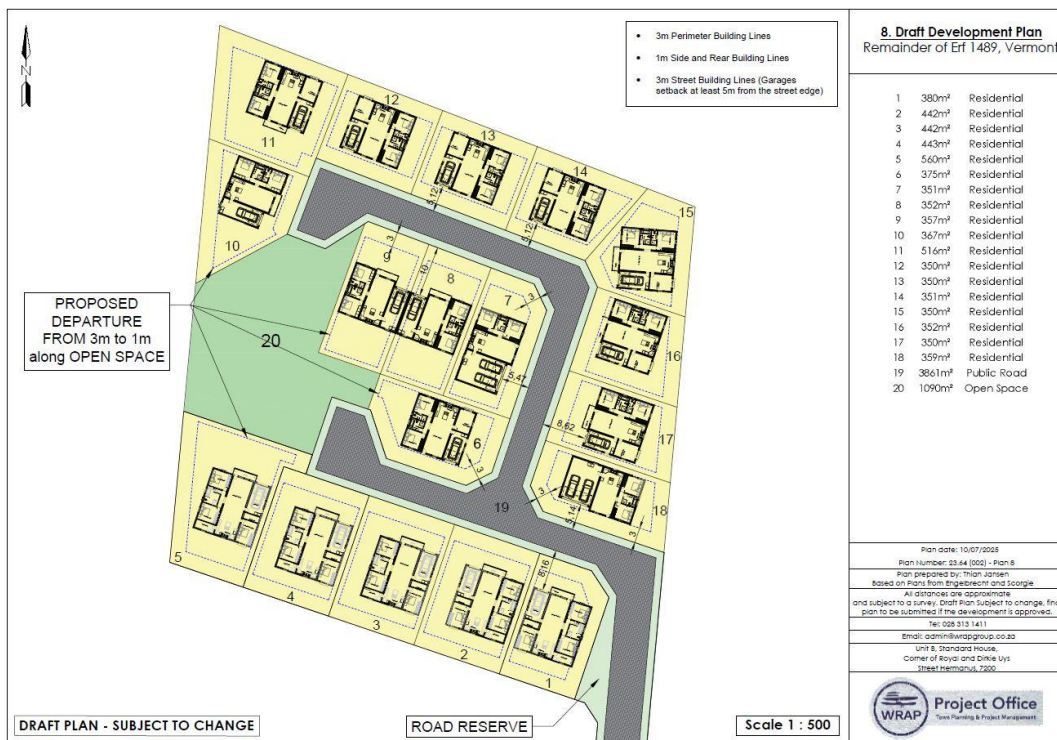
Proposed site development plan – Alternative 2 (Preferred).
